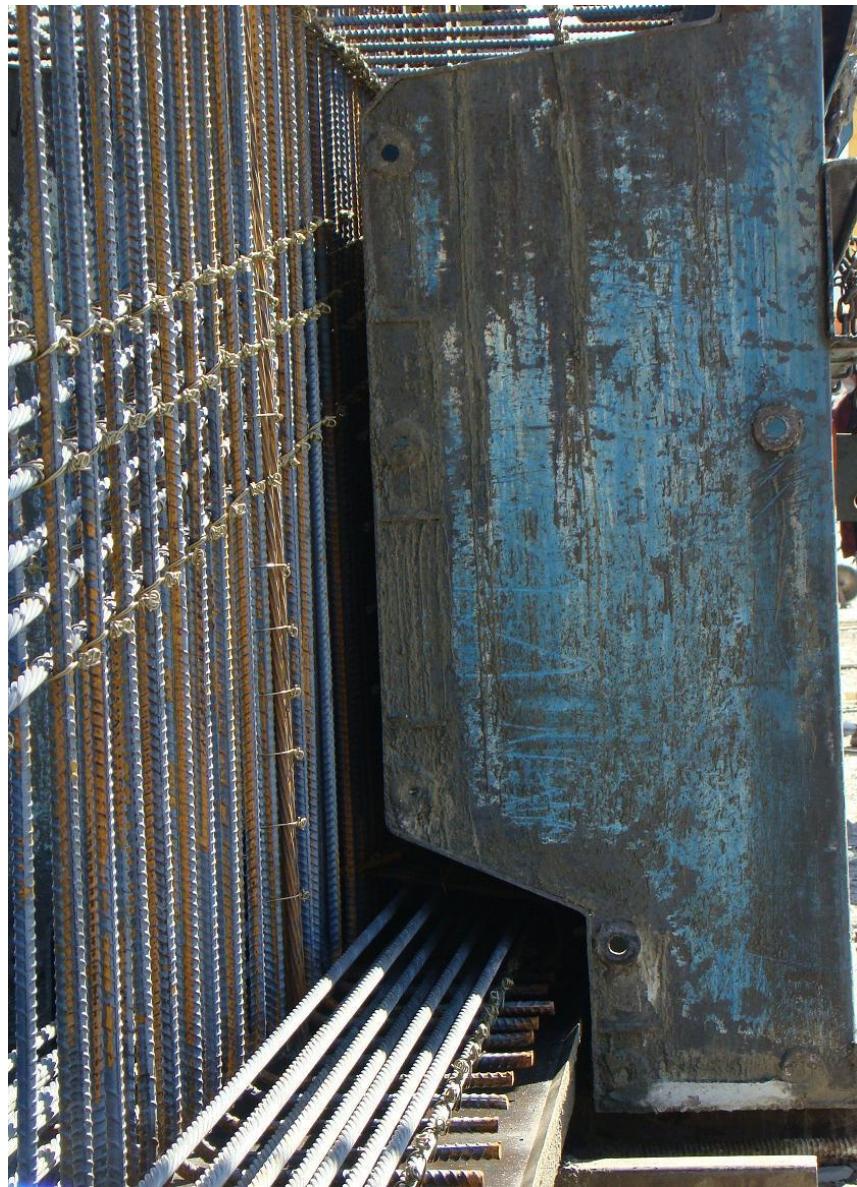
Formwork and reinforcement of a typical precast, prestressed bulb-tee girder
